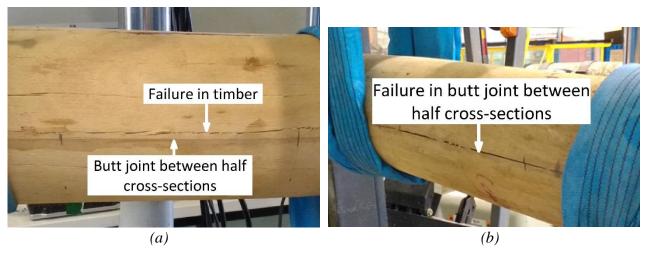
Shear tests failure modes (a) failure in the timber for all sections but C_G2_Cross (shown for S_G3) and (b) failure in the butt joint for C_G2_Cross
